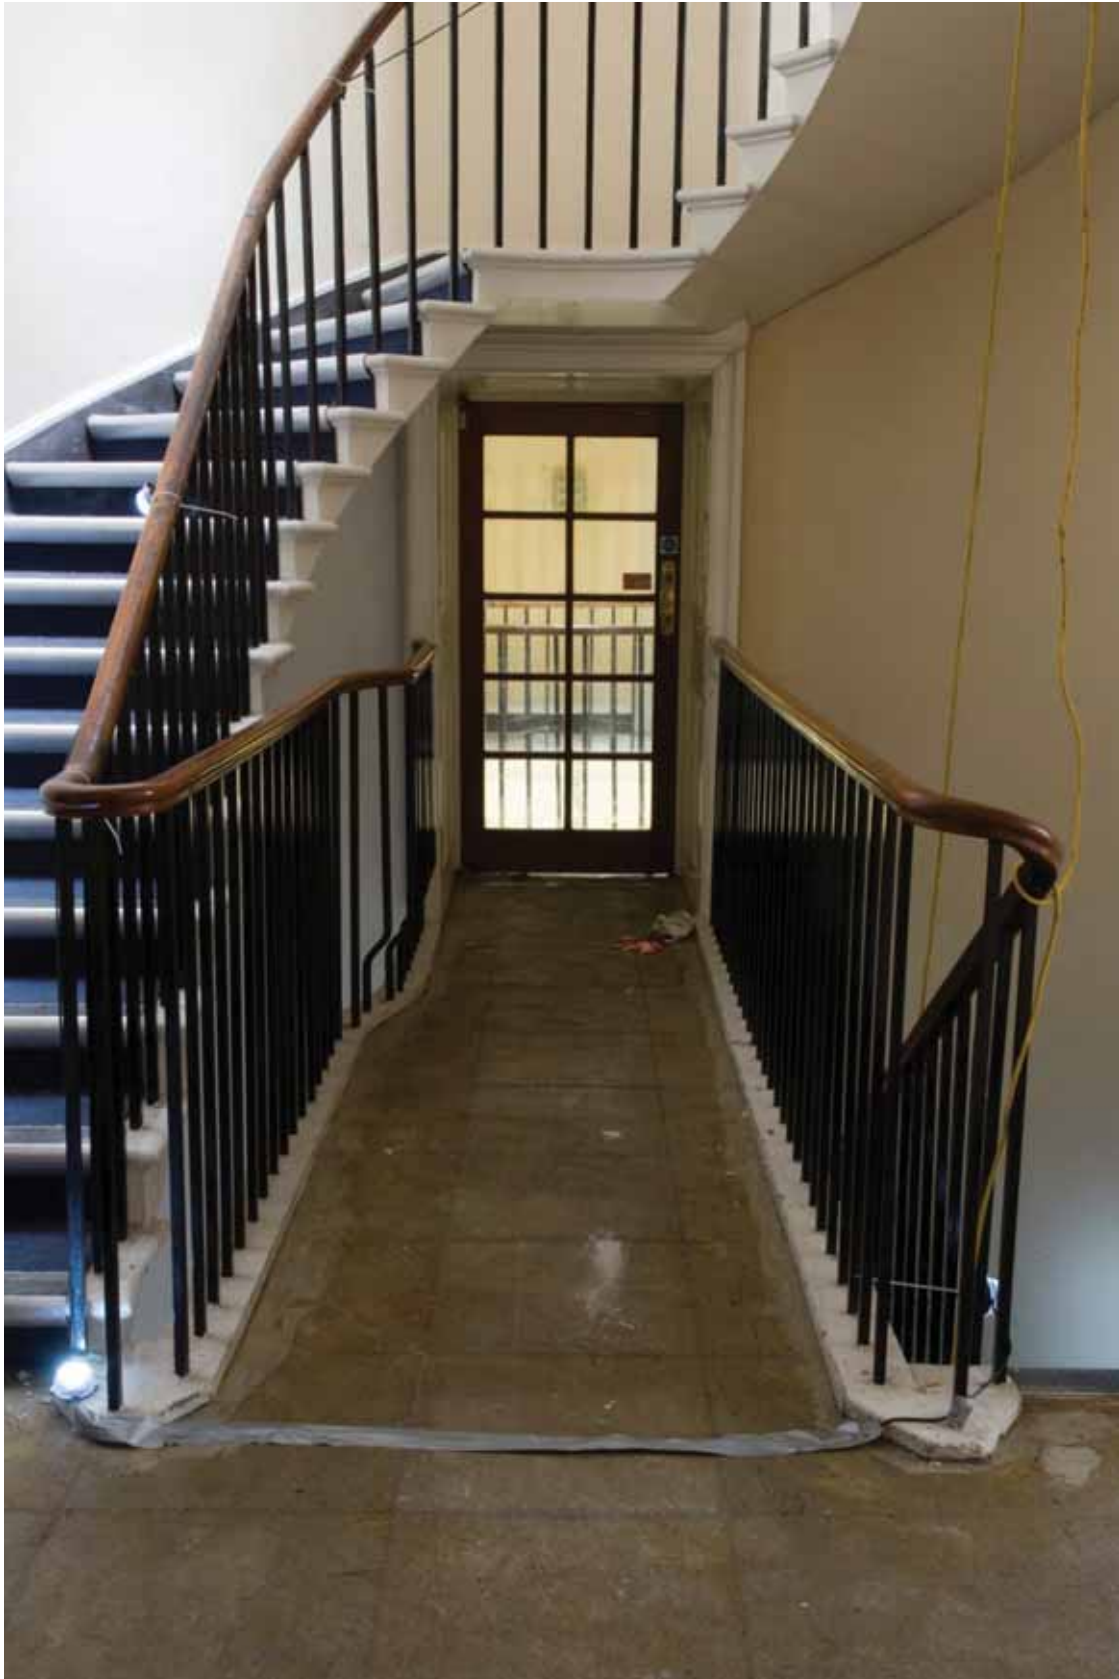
Link bridge in Stairs 02F, looking north (EAF10 B100 0956)
